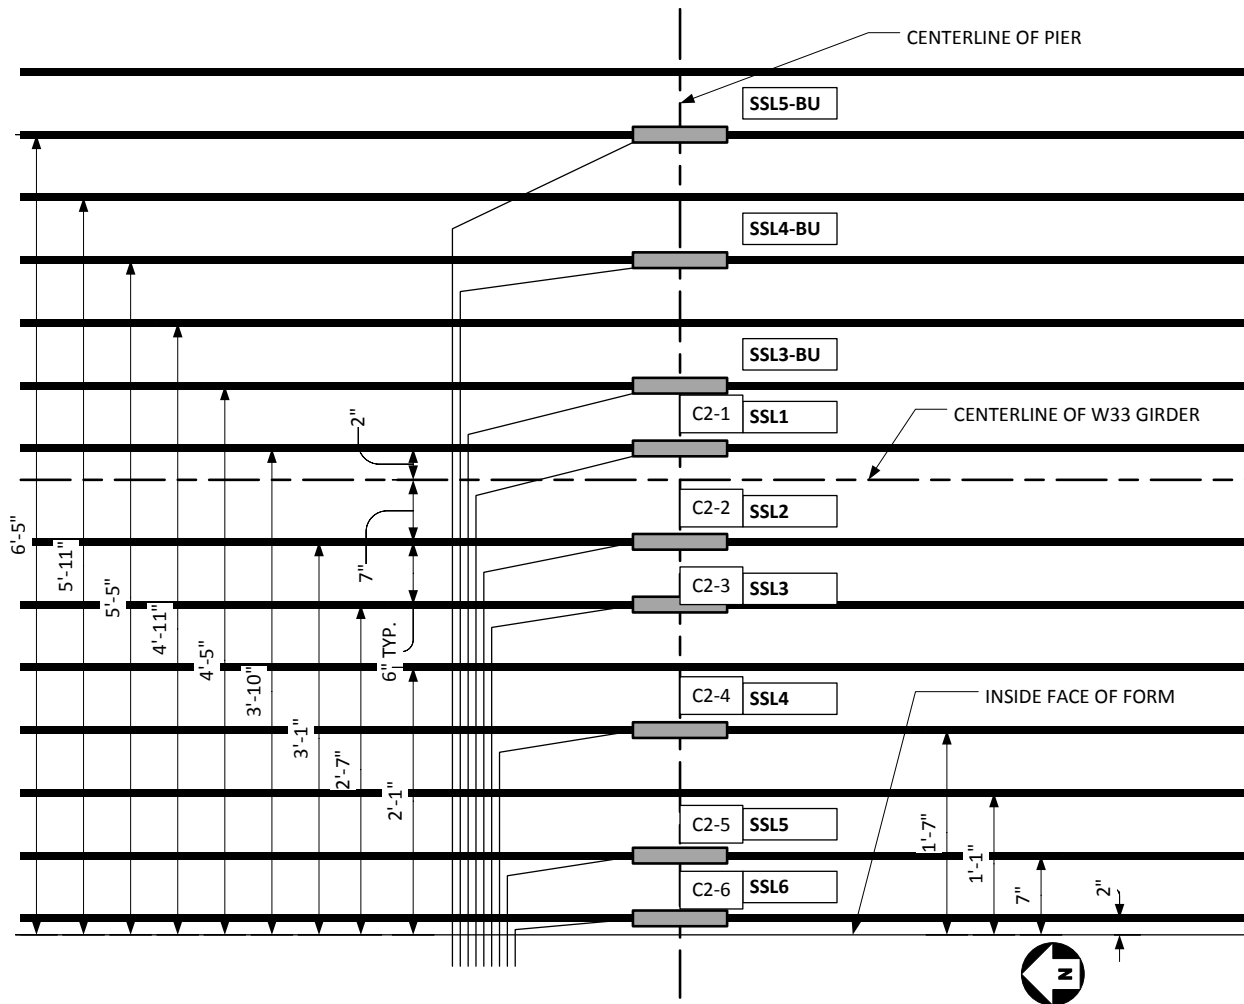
Instrumentation Layout on the Slab Reinforcing
